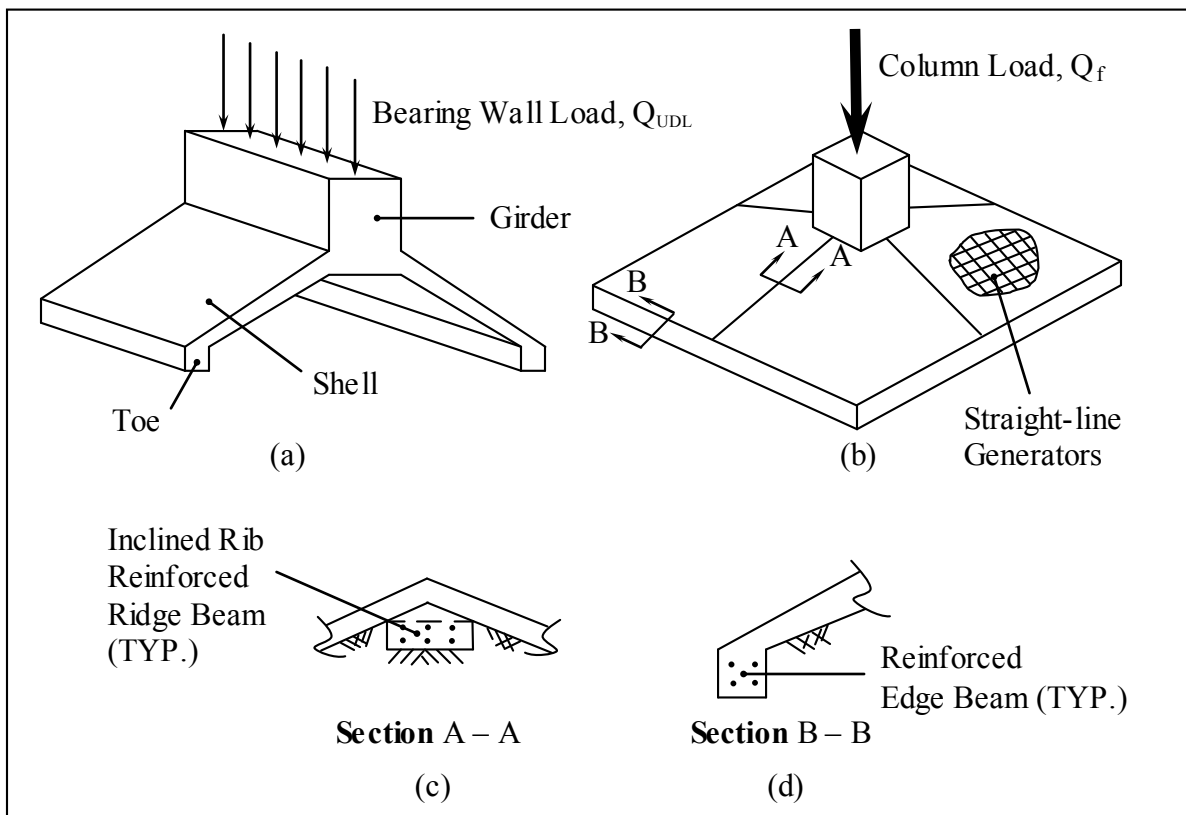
Shell Components: (a) Strip Shell Footing (b) Isolated Shell Footing
